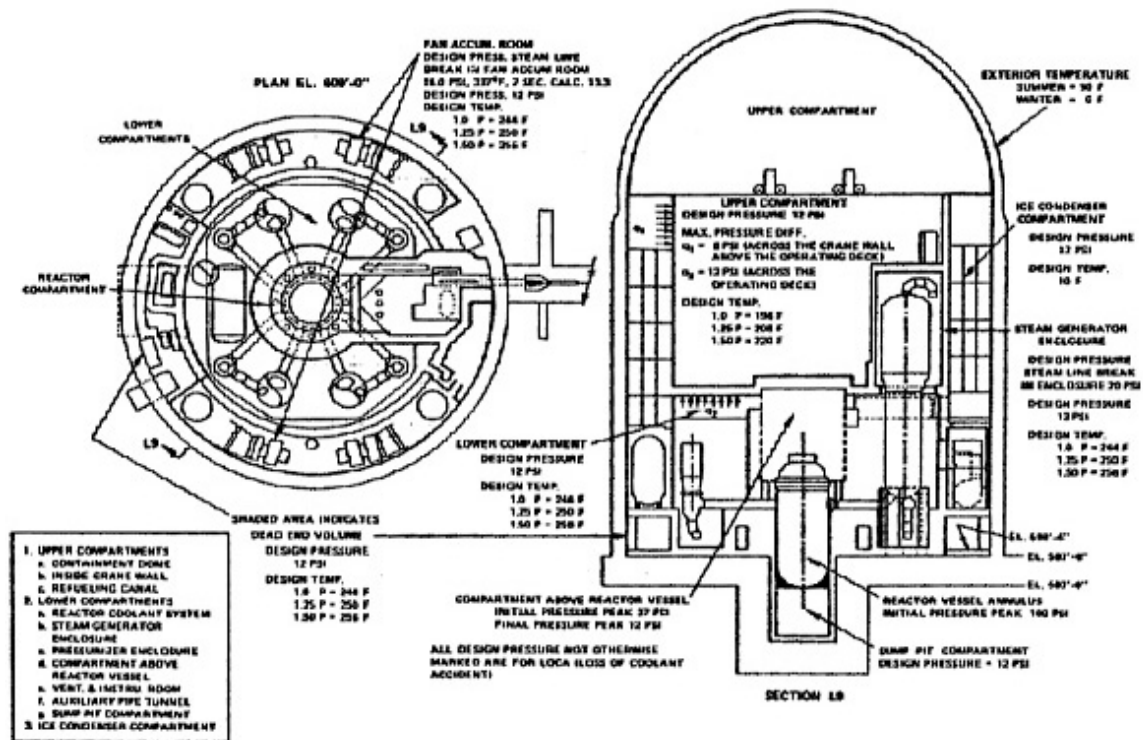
Detail of Ice Containment design. Source: Westinghouse.
